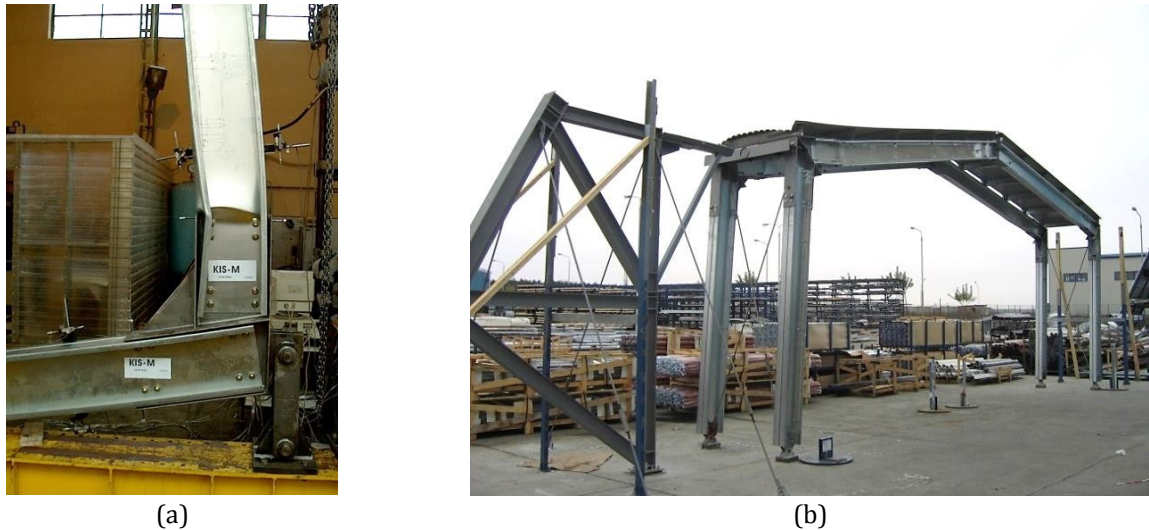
Component tests (a) and system-level tests (b) on cold-formed steel portal frames of back-to-back channel sections and bolted joints.
